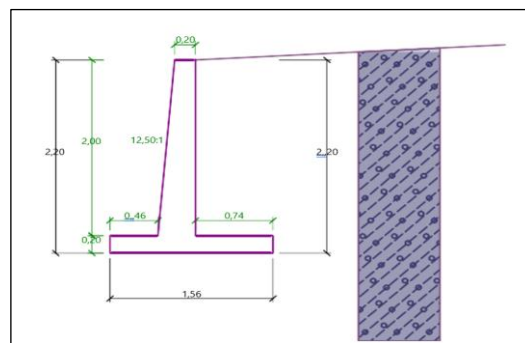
Planning of a retaining wall with a cantilever wall type at location point 5
